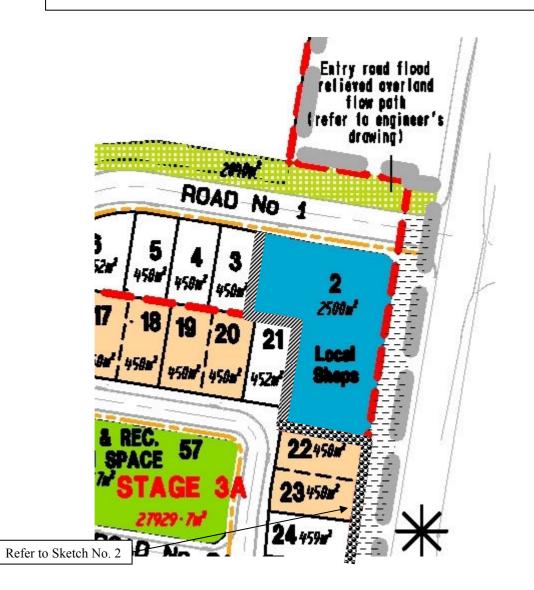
Local Shop Site Recommended Acoustic Barriers (Not to Scale)
